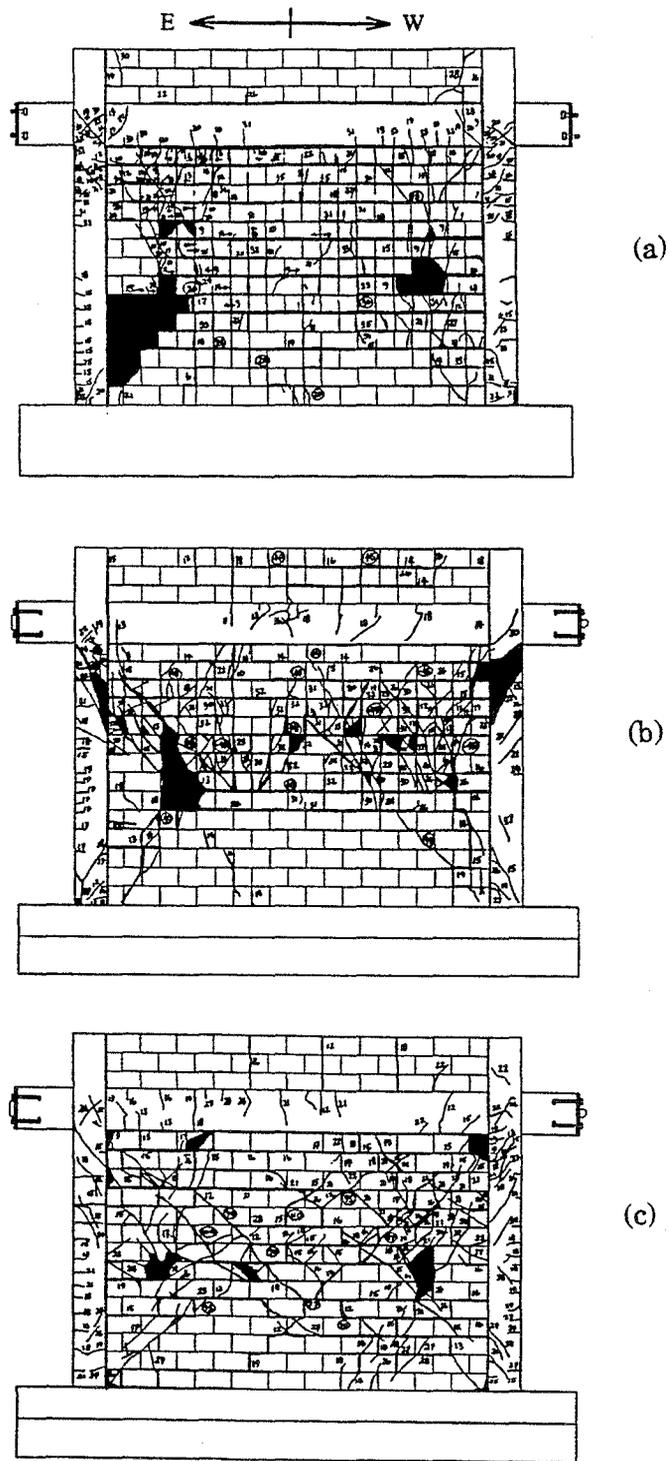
Failure Patterns of Infilled Frames: (a) Sliding of Bed Joints (Specimen 4); (b) Shear Failure of Columns (Specimen 5); (c) Crushing at Panel Corners (Specimen 7)
